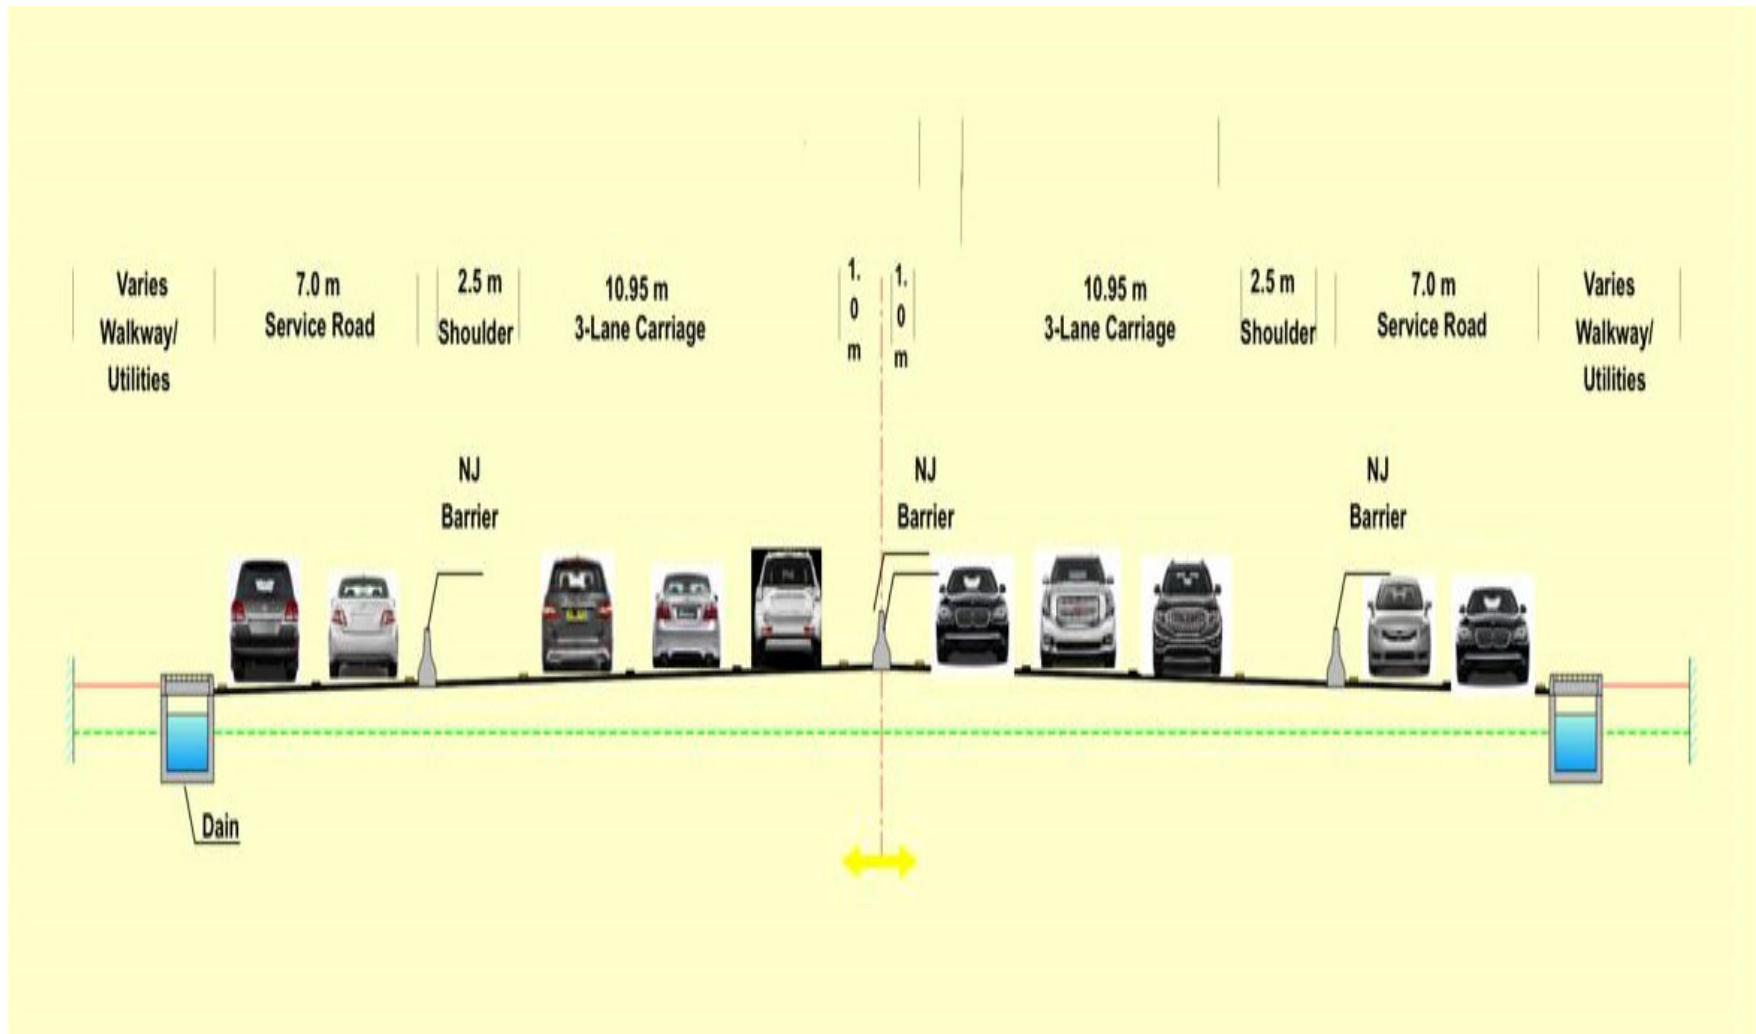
Typical Cross Section of the 3 Lane Road With Service Road
